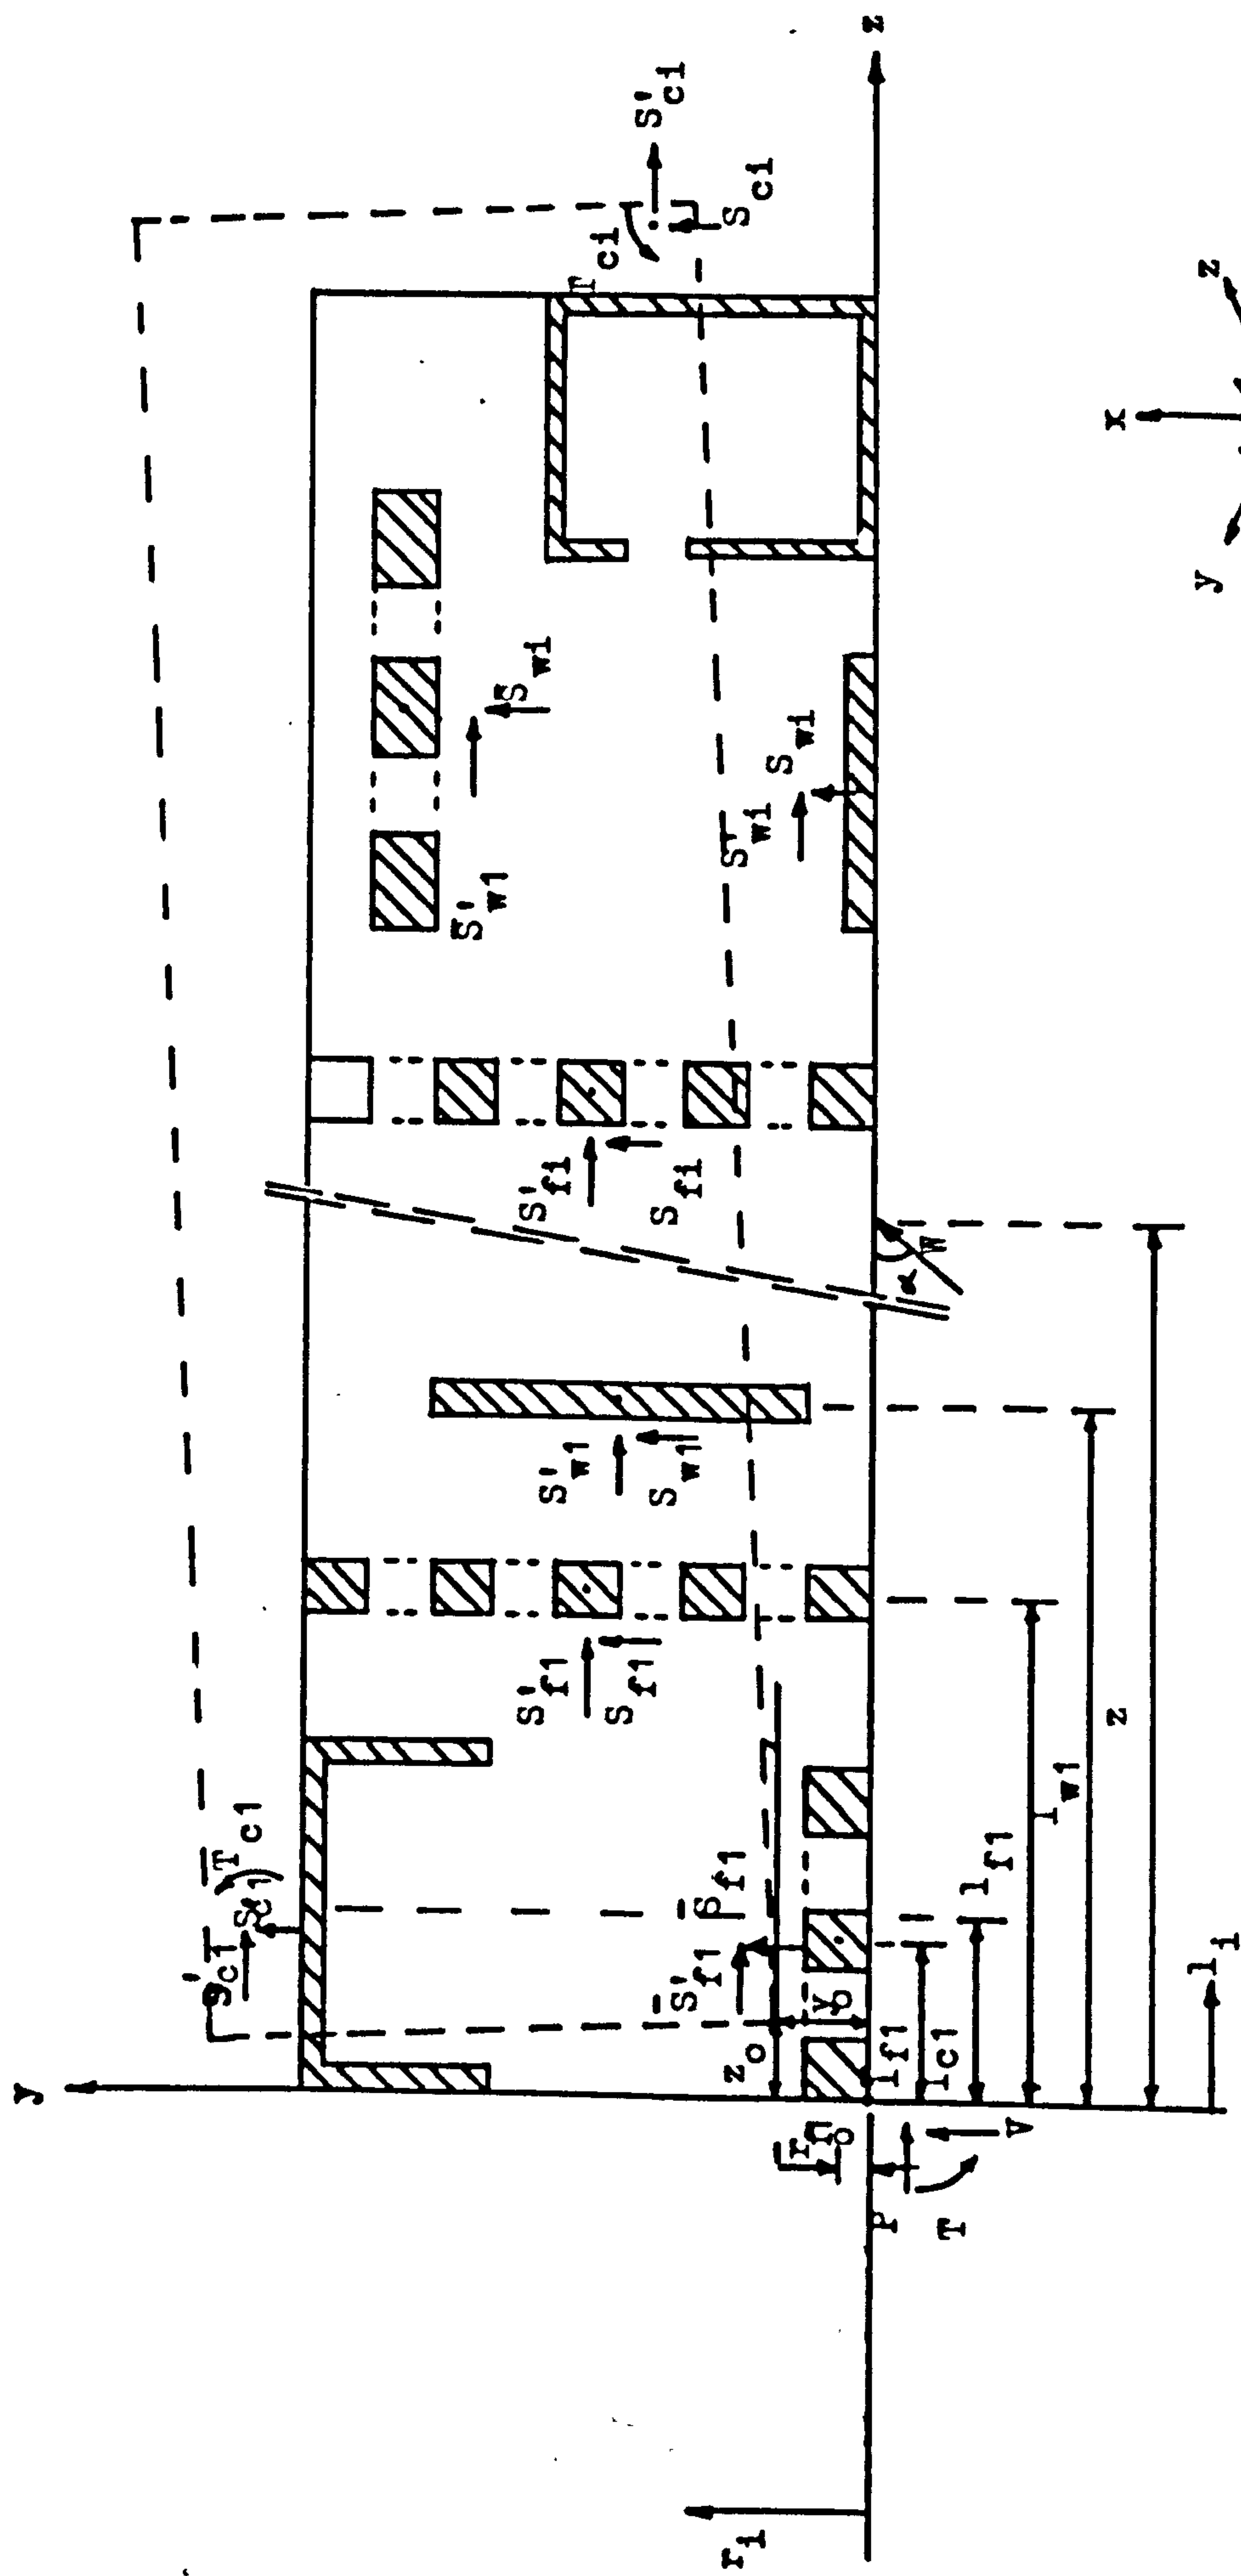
Asymmetrical structure consisting of cores, shear walls and assemblies of frames in two orthogonal directions
